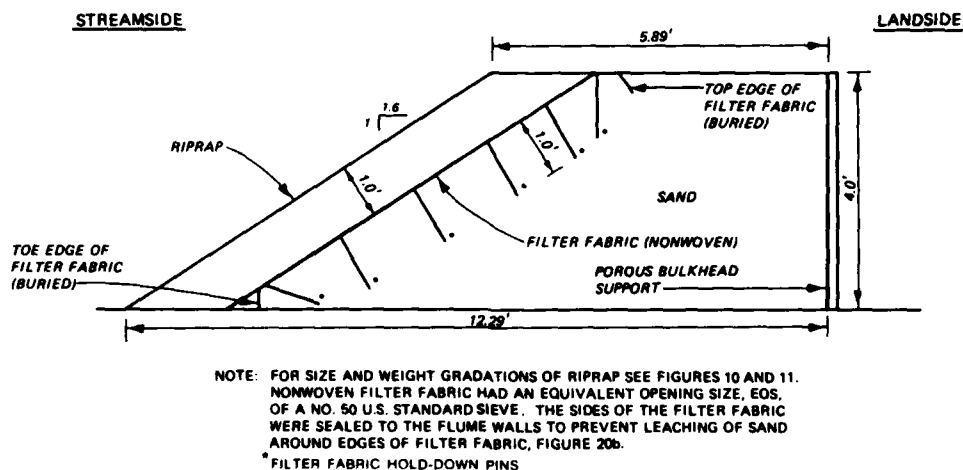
Plan 6A, sand streambank with 1.0 ft of riprap and nonwoven filter fabric protection
